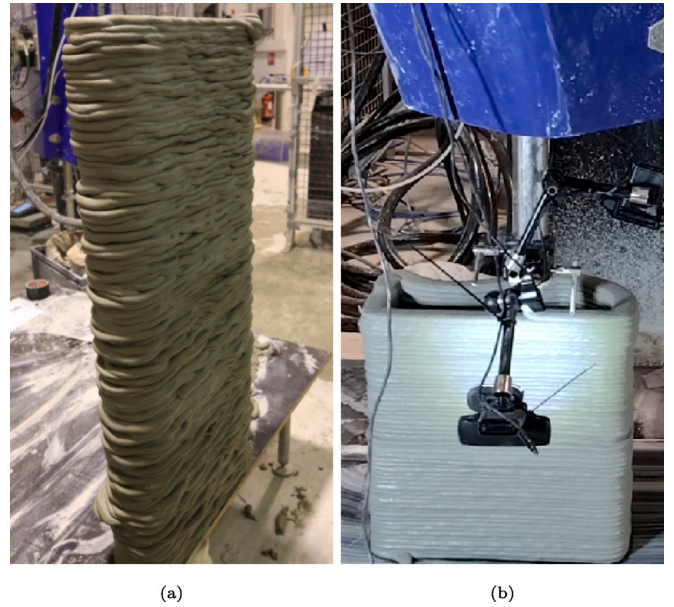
(a) Experimental sample printed with purposely created defects. (b) Example of acceptable printing without purposely created defects.
